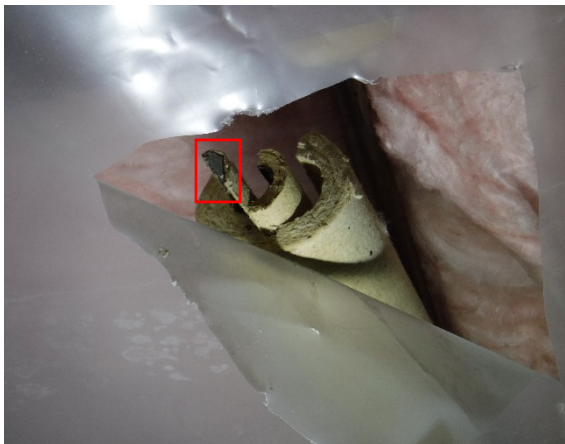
Photo of sample AS-24, Room 118, Ceiling – Piping Insulation, Tar Paper on Straight Run, 8% Chrysotile Asbestos.
